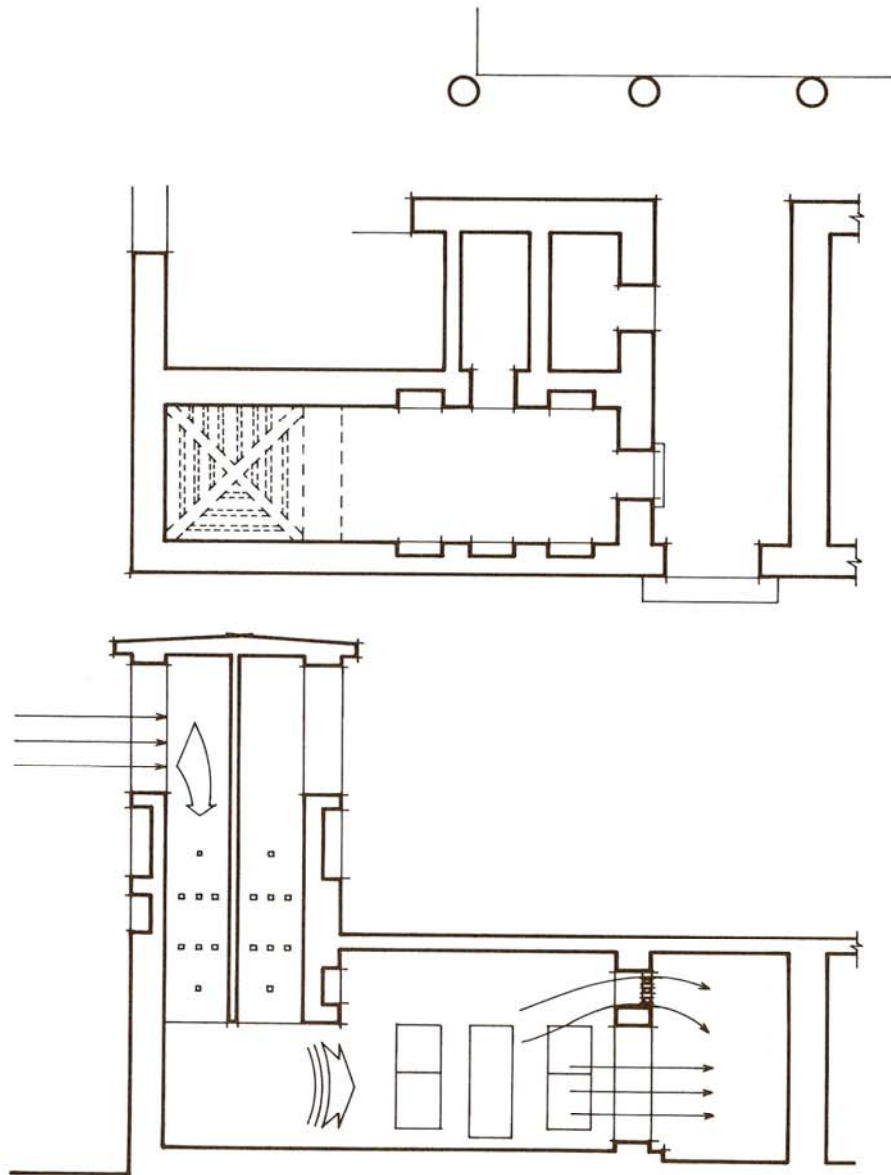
Plan and section of the *bādgīr* in figs. 64 and 65. (See p. 60.)
